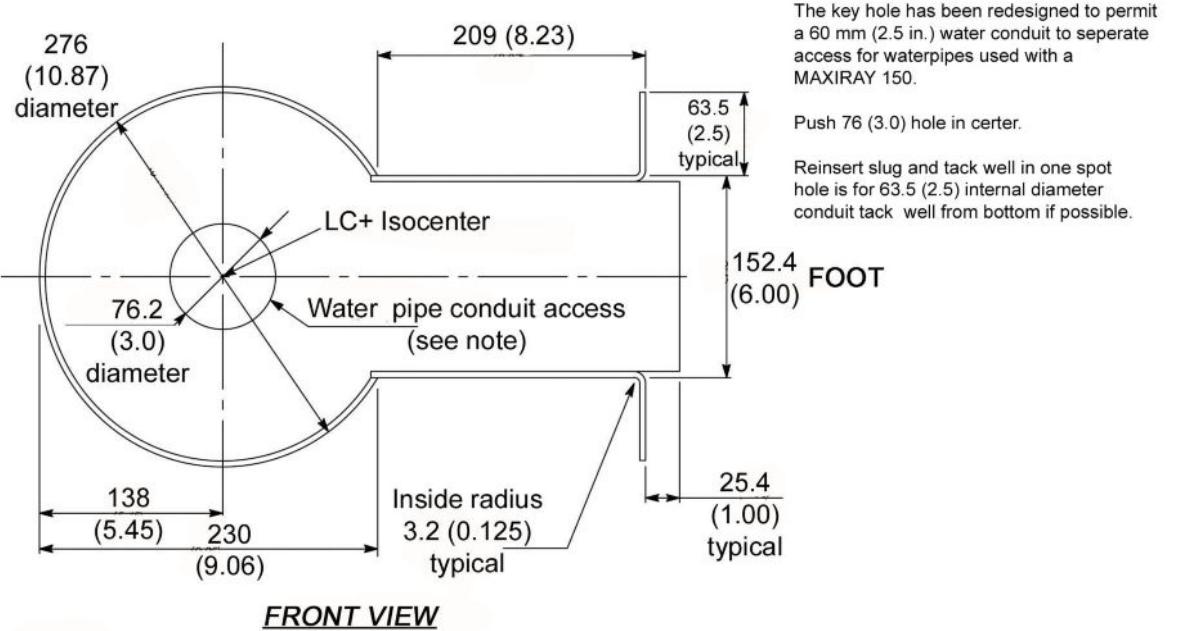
Cable Conduit For On-Grade Floor Anchor Kit
